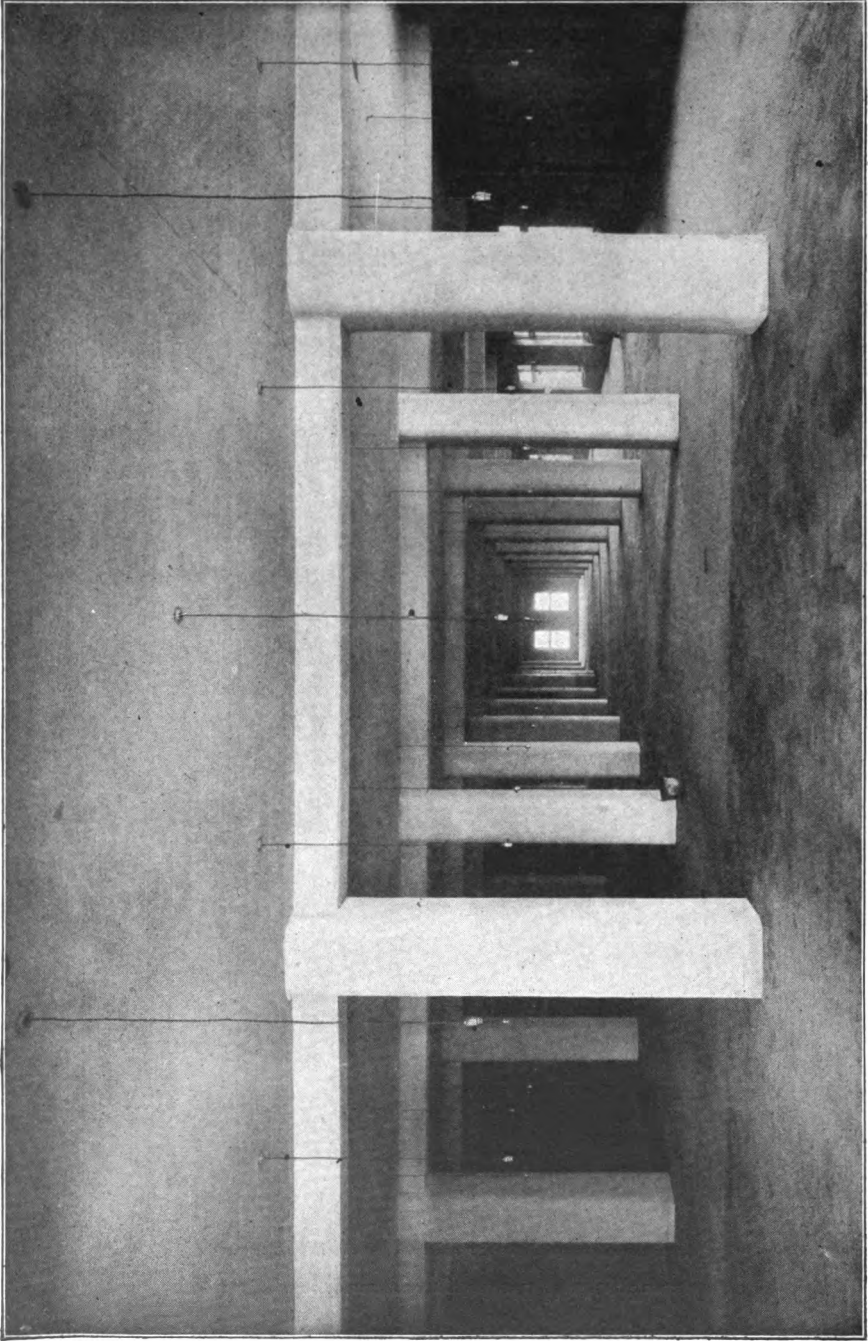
Reinforced Concrete Construction Showing Girders in One Direction Only and Long Span Slab
